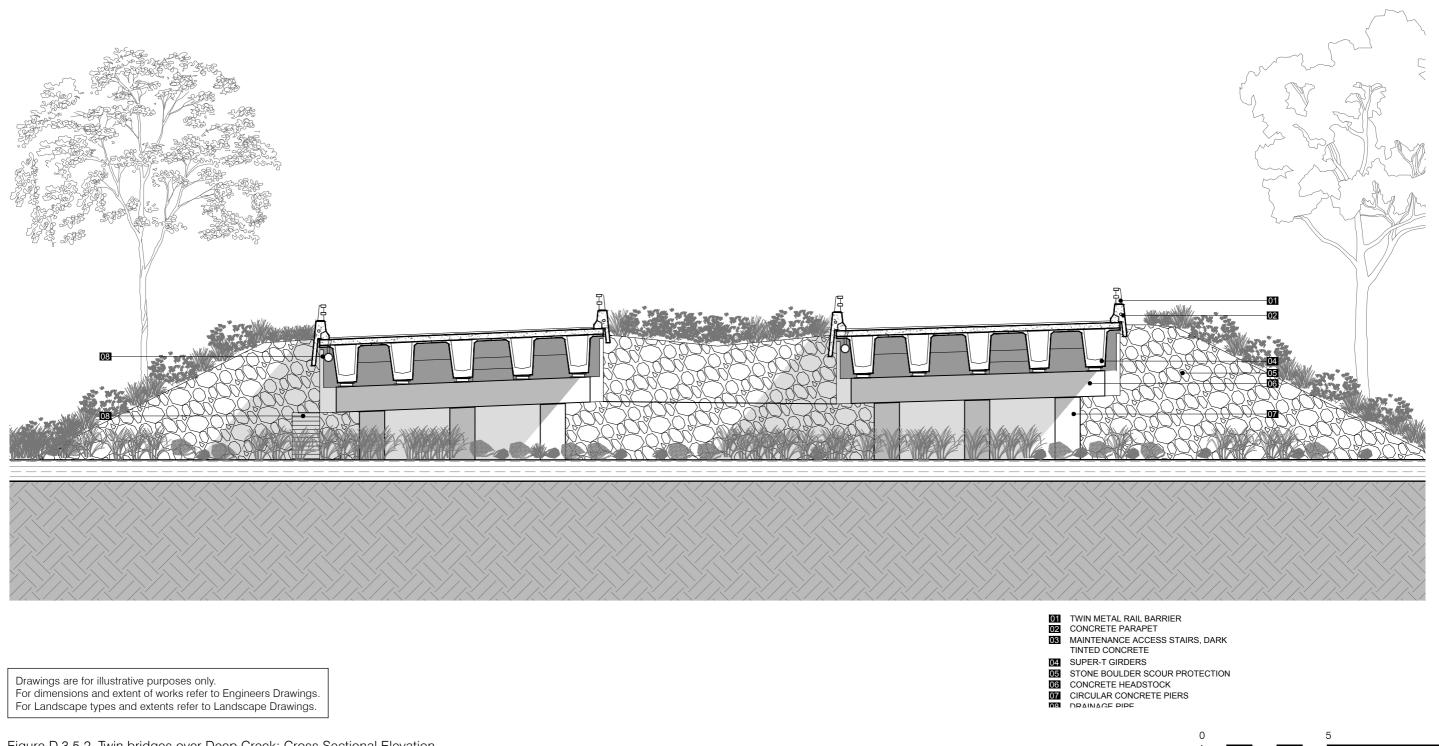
Twin bridges over Deep Creek: Cross Sectional Elevation
